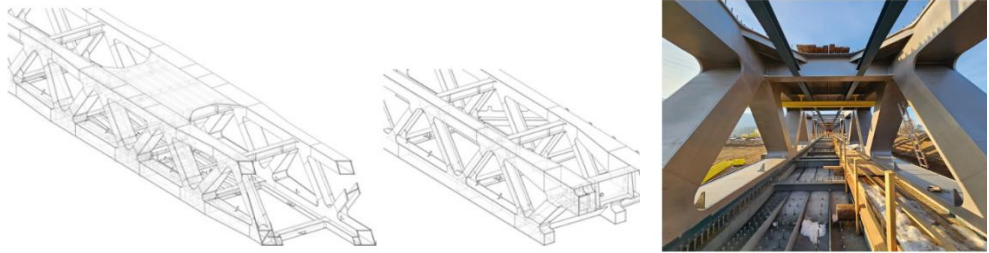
Replacement of the steel superstructure by a new double-track orthotropic two-level composite bridge with steel truss girders
